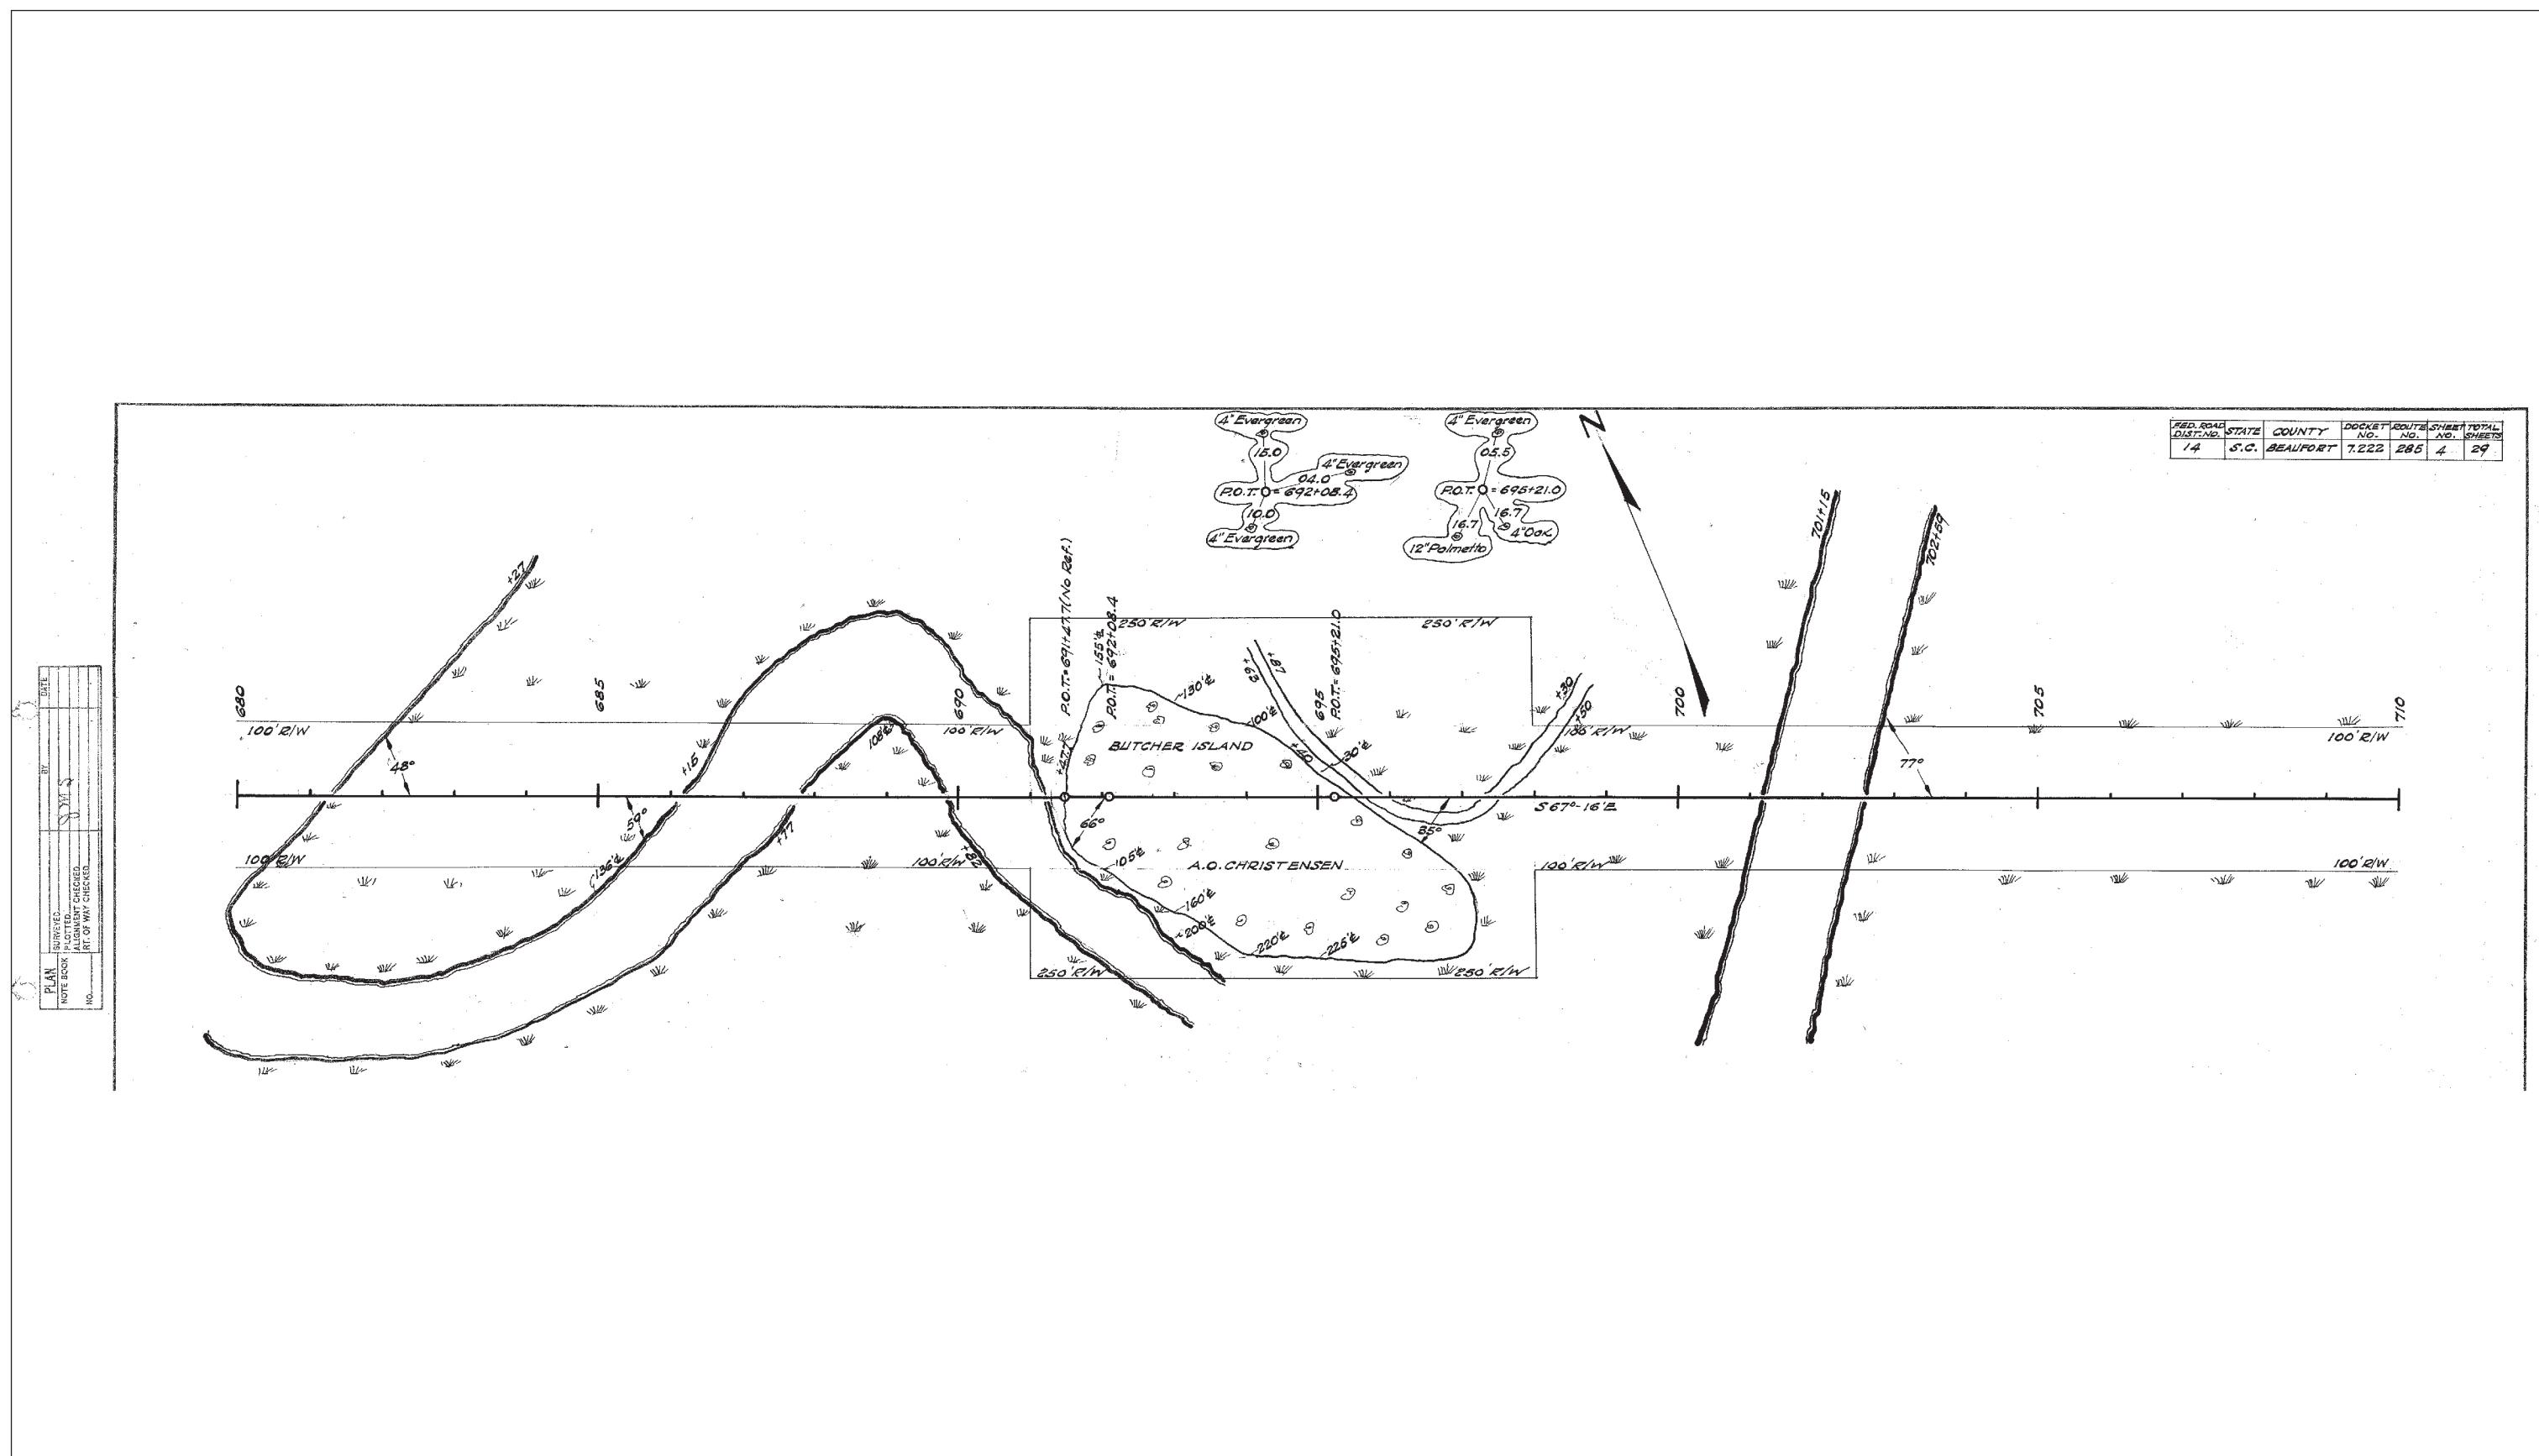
Portion of the 1940 highway construction plans showing Butcher's Island.
